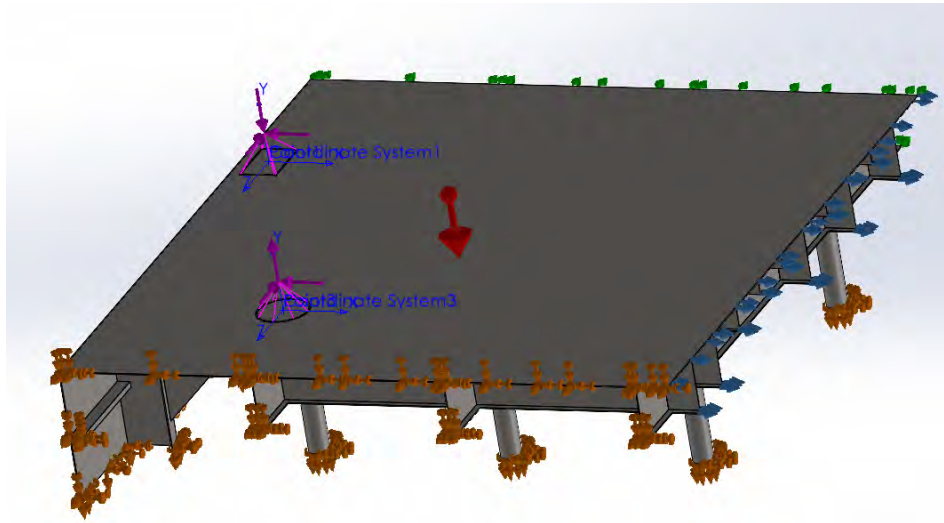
12 Roller Slider Fixture indicated in blue color.
